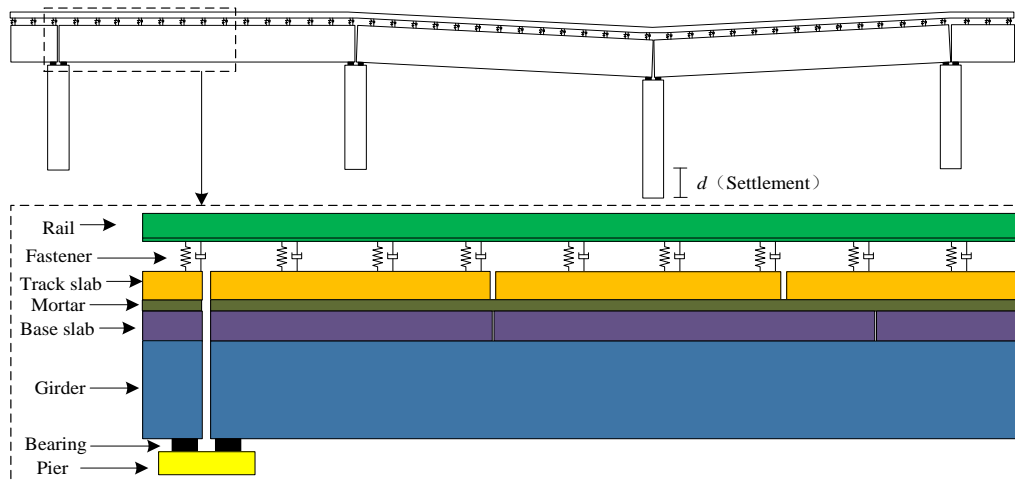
Deformation of the CRTS I slab ballastless track under bridge pier settlement
